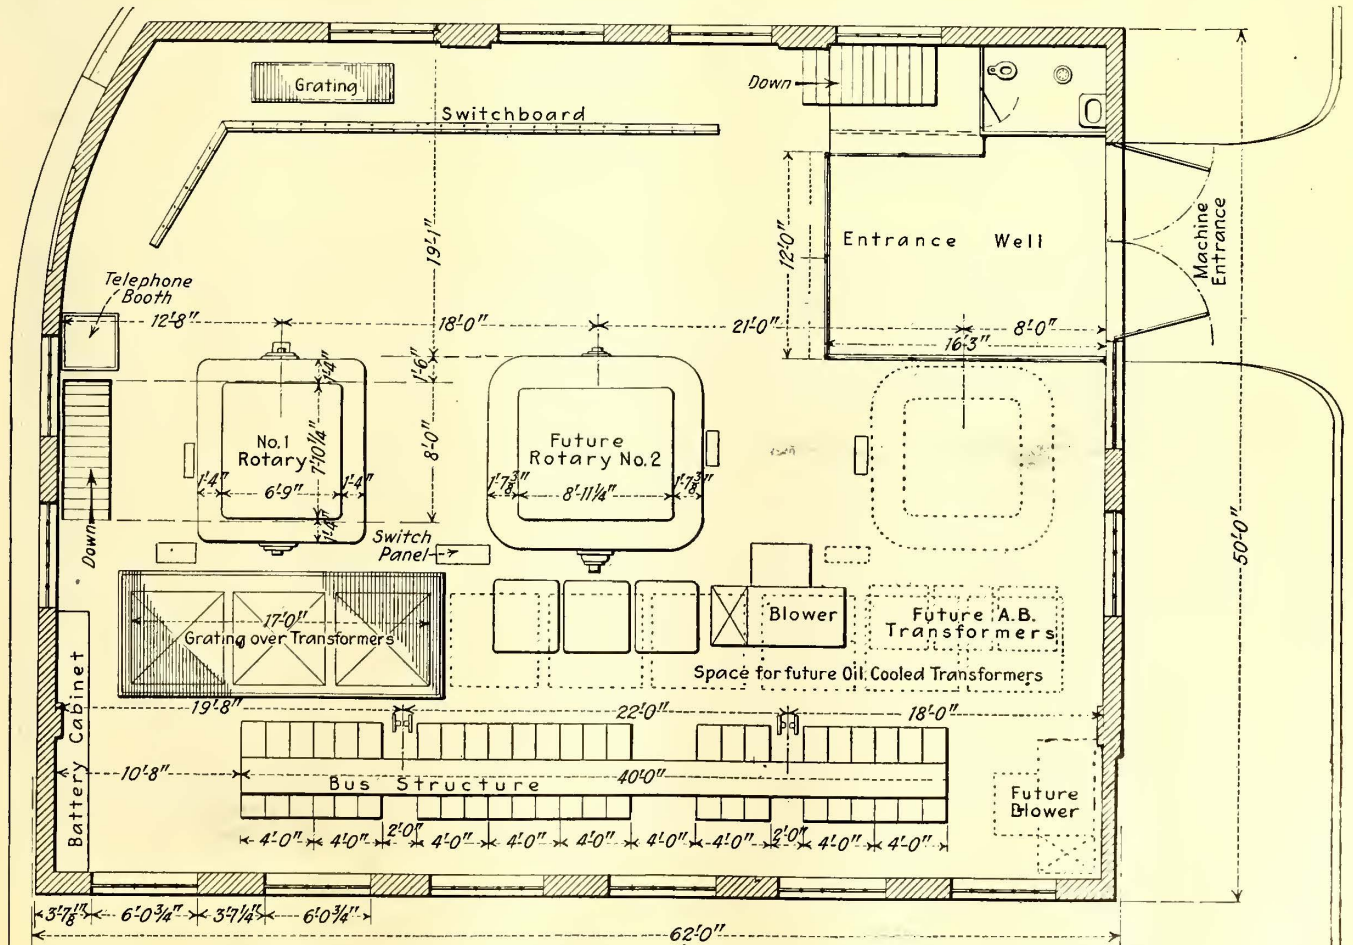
FLOOR PLAN AND LAYOUT OF EQUIPMENT IN NEW KANSAS CITY SUBSTATION
